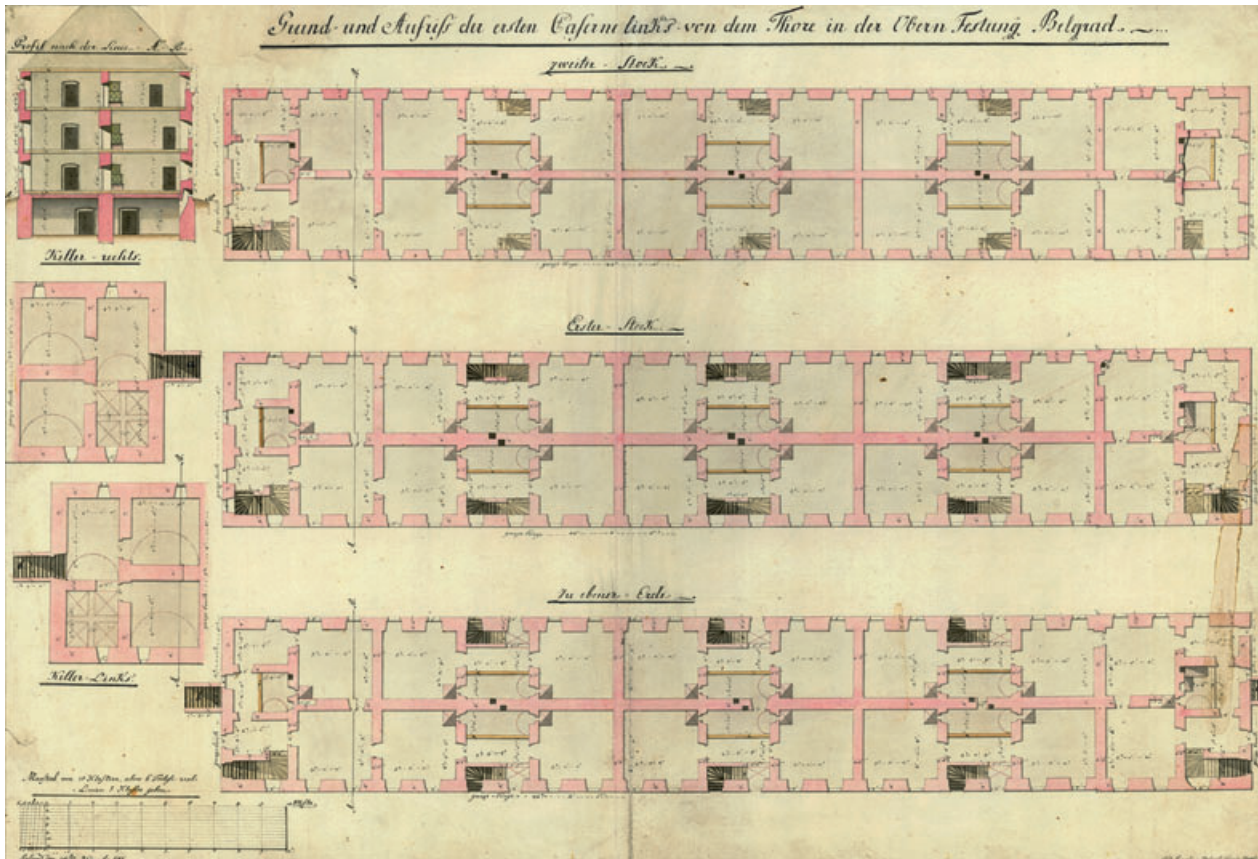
Plan of the barracks next to the SE rampart with floor plans and cross-sections from 1790 (Vienna War Archives, sig. GVII_11_422)
